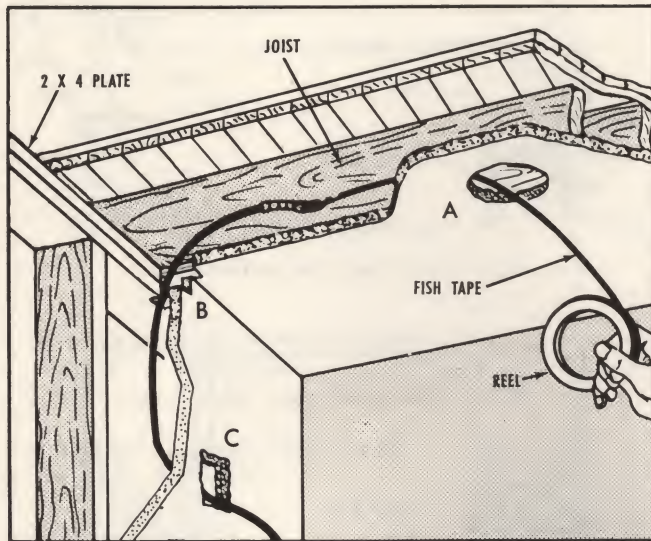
"OLD WORK" CEILING TO WALL INSTALLATION
